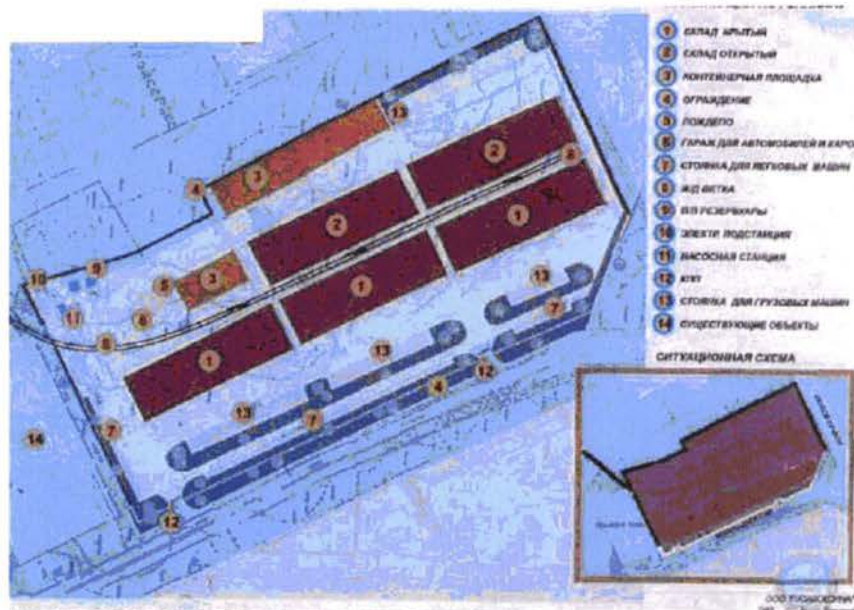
Master plan of new LC planned at Sergely site Byuszvnehtans
